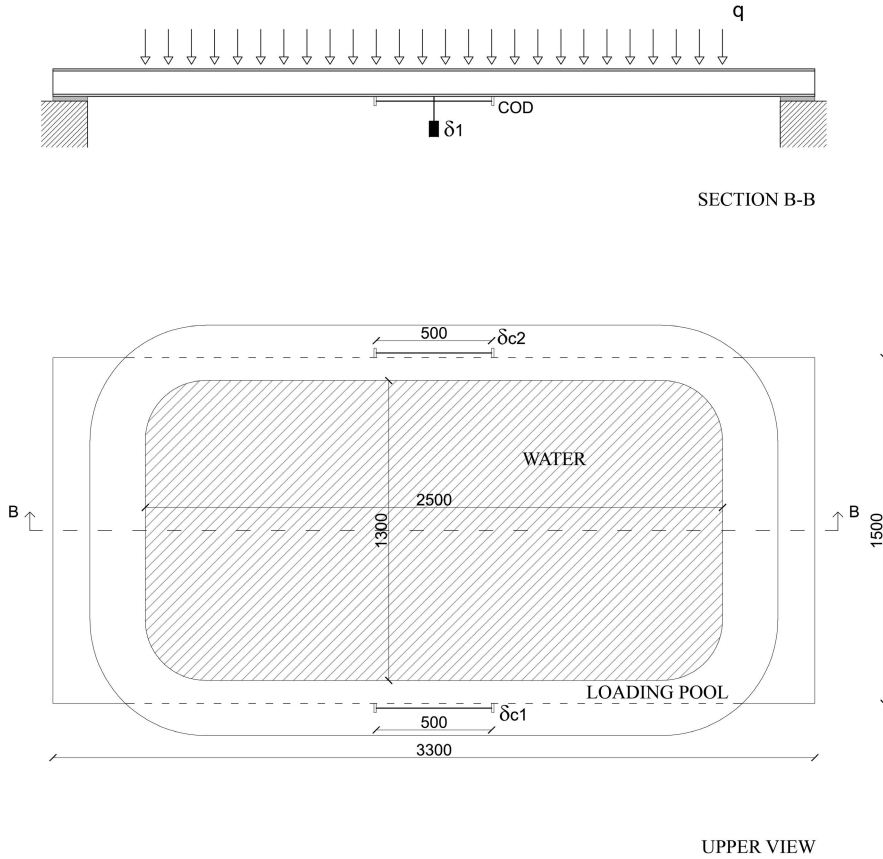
Full scale panel: loading scheme at SLS test (measures in mm).
